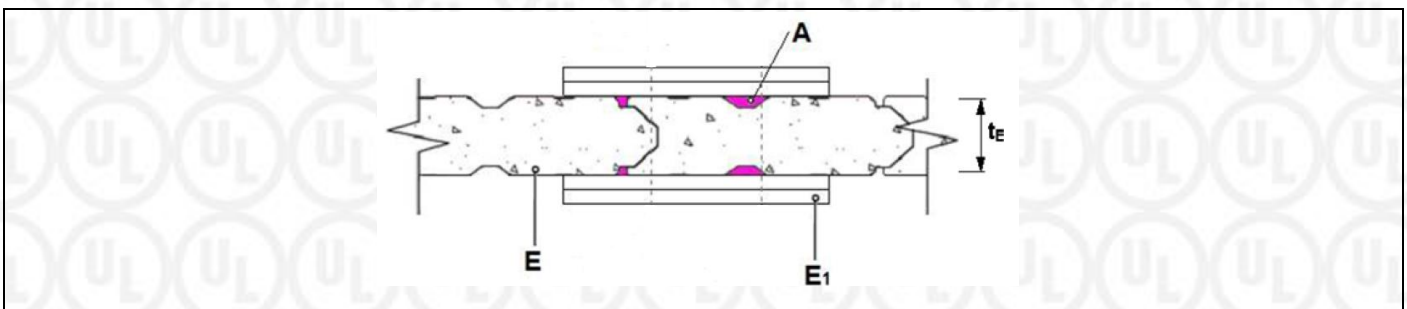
Horizontal cross section for build-up and sealant in Speedpanel/Speedwall.
